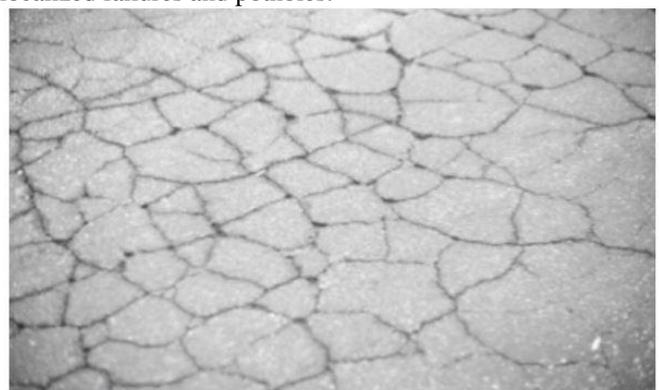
Fatigue (alligator) cracking in Flexible Pavement
